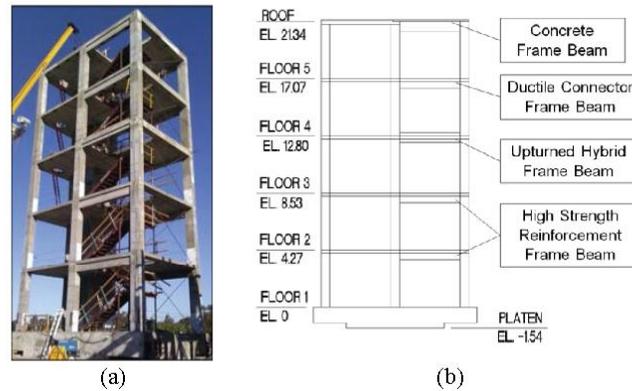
Test specimen (a) skeleton; (b) elevation view (elevation in m) [images and schematic from 8].
